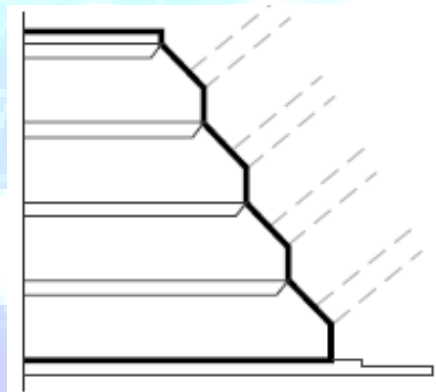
Inclined PV/Stepped Curtain Wall
